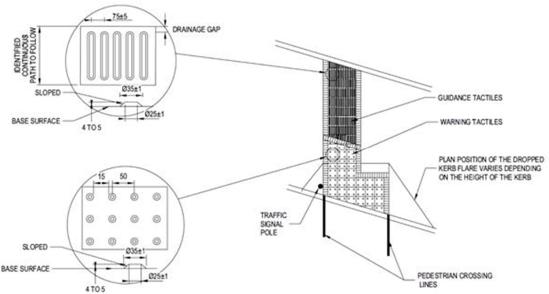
Tactile paving plan for a controlled pedestrian crossing
